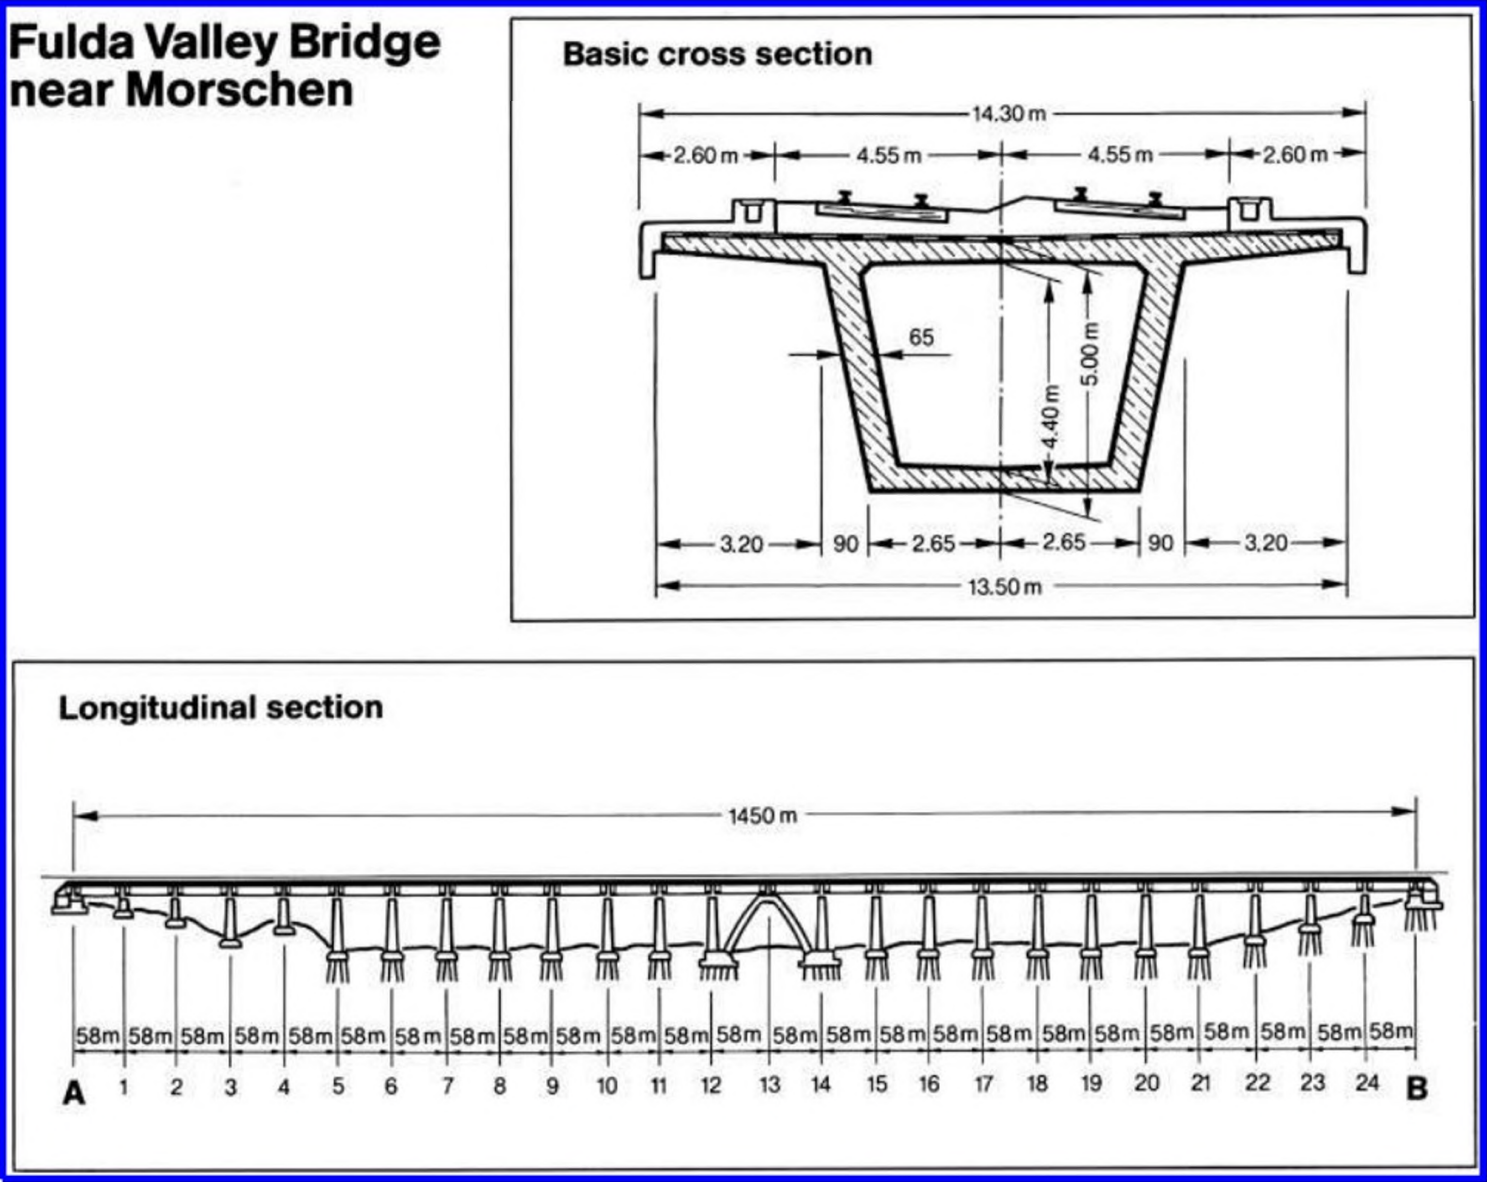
Longitudinal and cross section of Fulda viaduct, German HS Lines.
